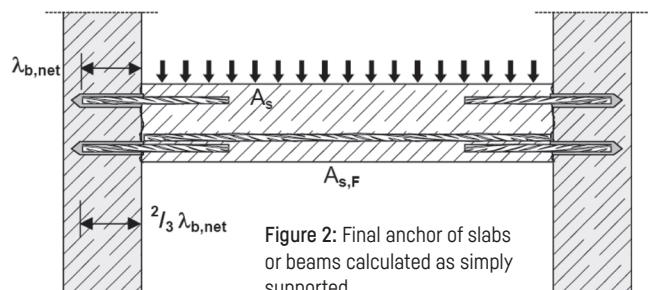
Final anchor of slabs or beams calculated as simply supported.
